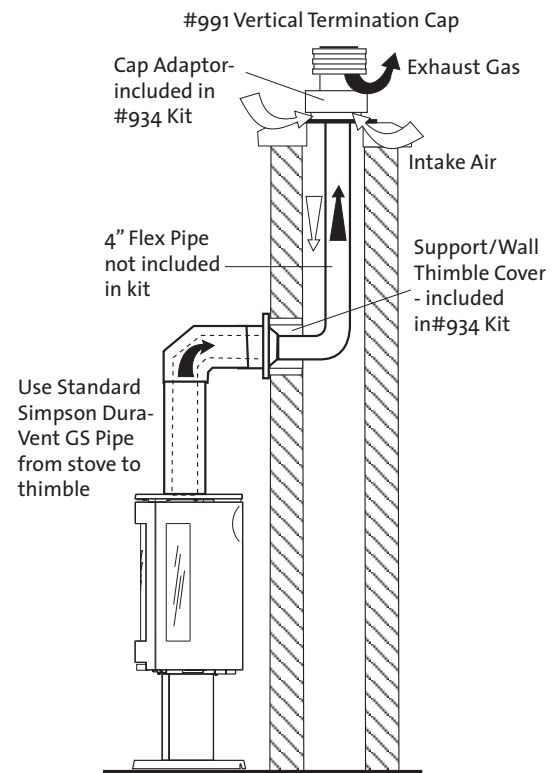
Vent System through a masonry chimney using the Simpson Dura-Vent Chimney Conversion Kit #934. Other manufacturers use similar designs. May also be used in listed prefabricated chimneys.
